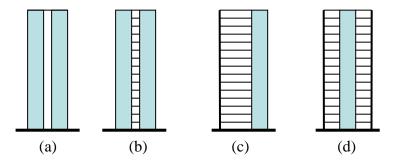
Wall systems (a) uncoupled, (b) coupled, (c) wall-frame and (d) core wall with frame
